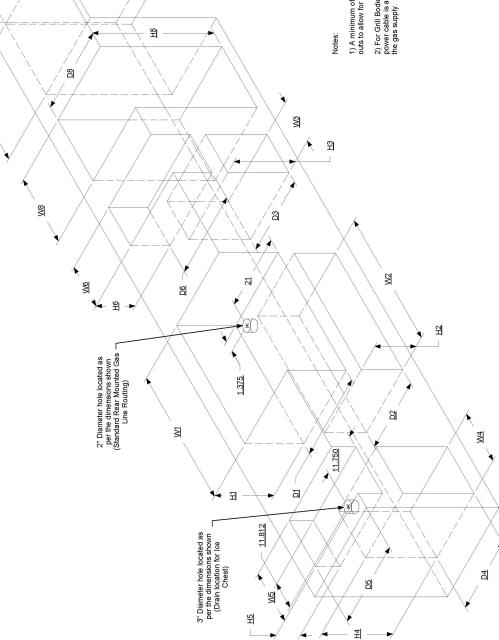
REFERENCE DRAWING FOR CUT-OUT DIMENSIONS
